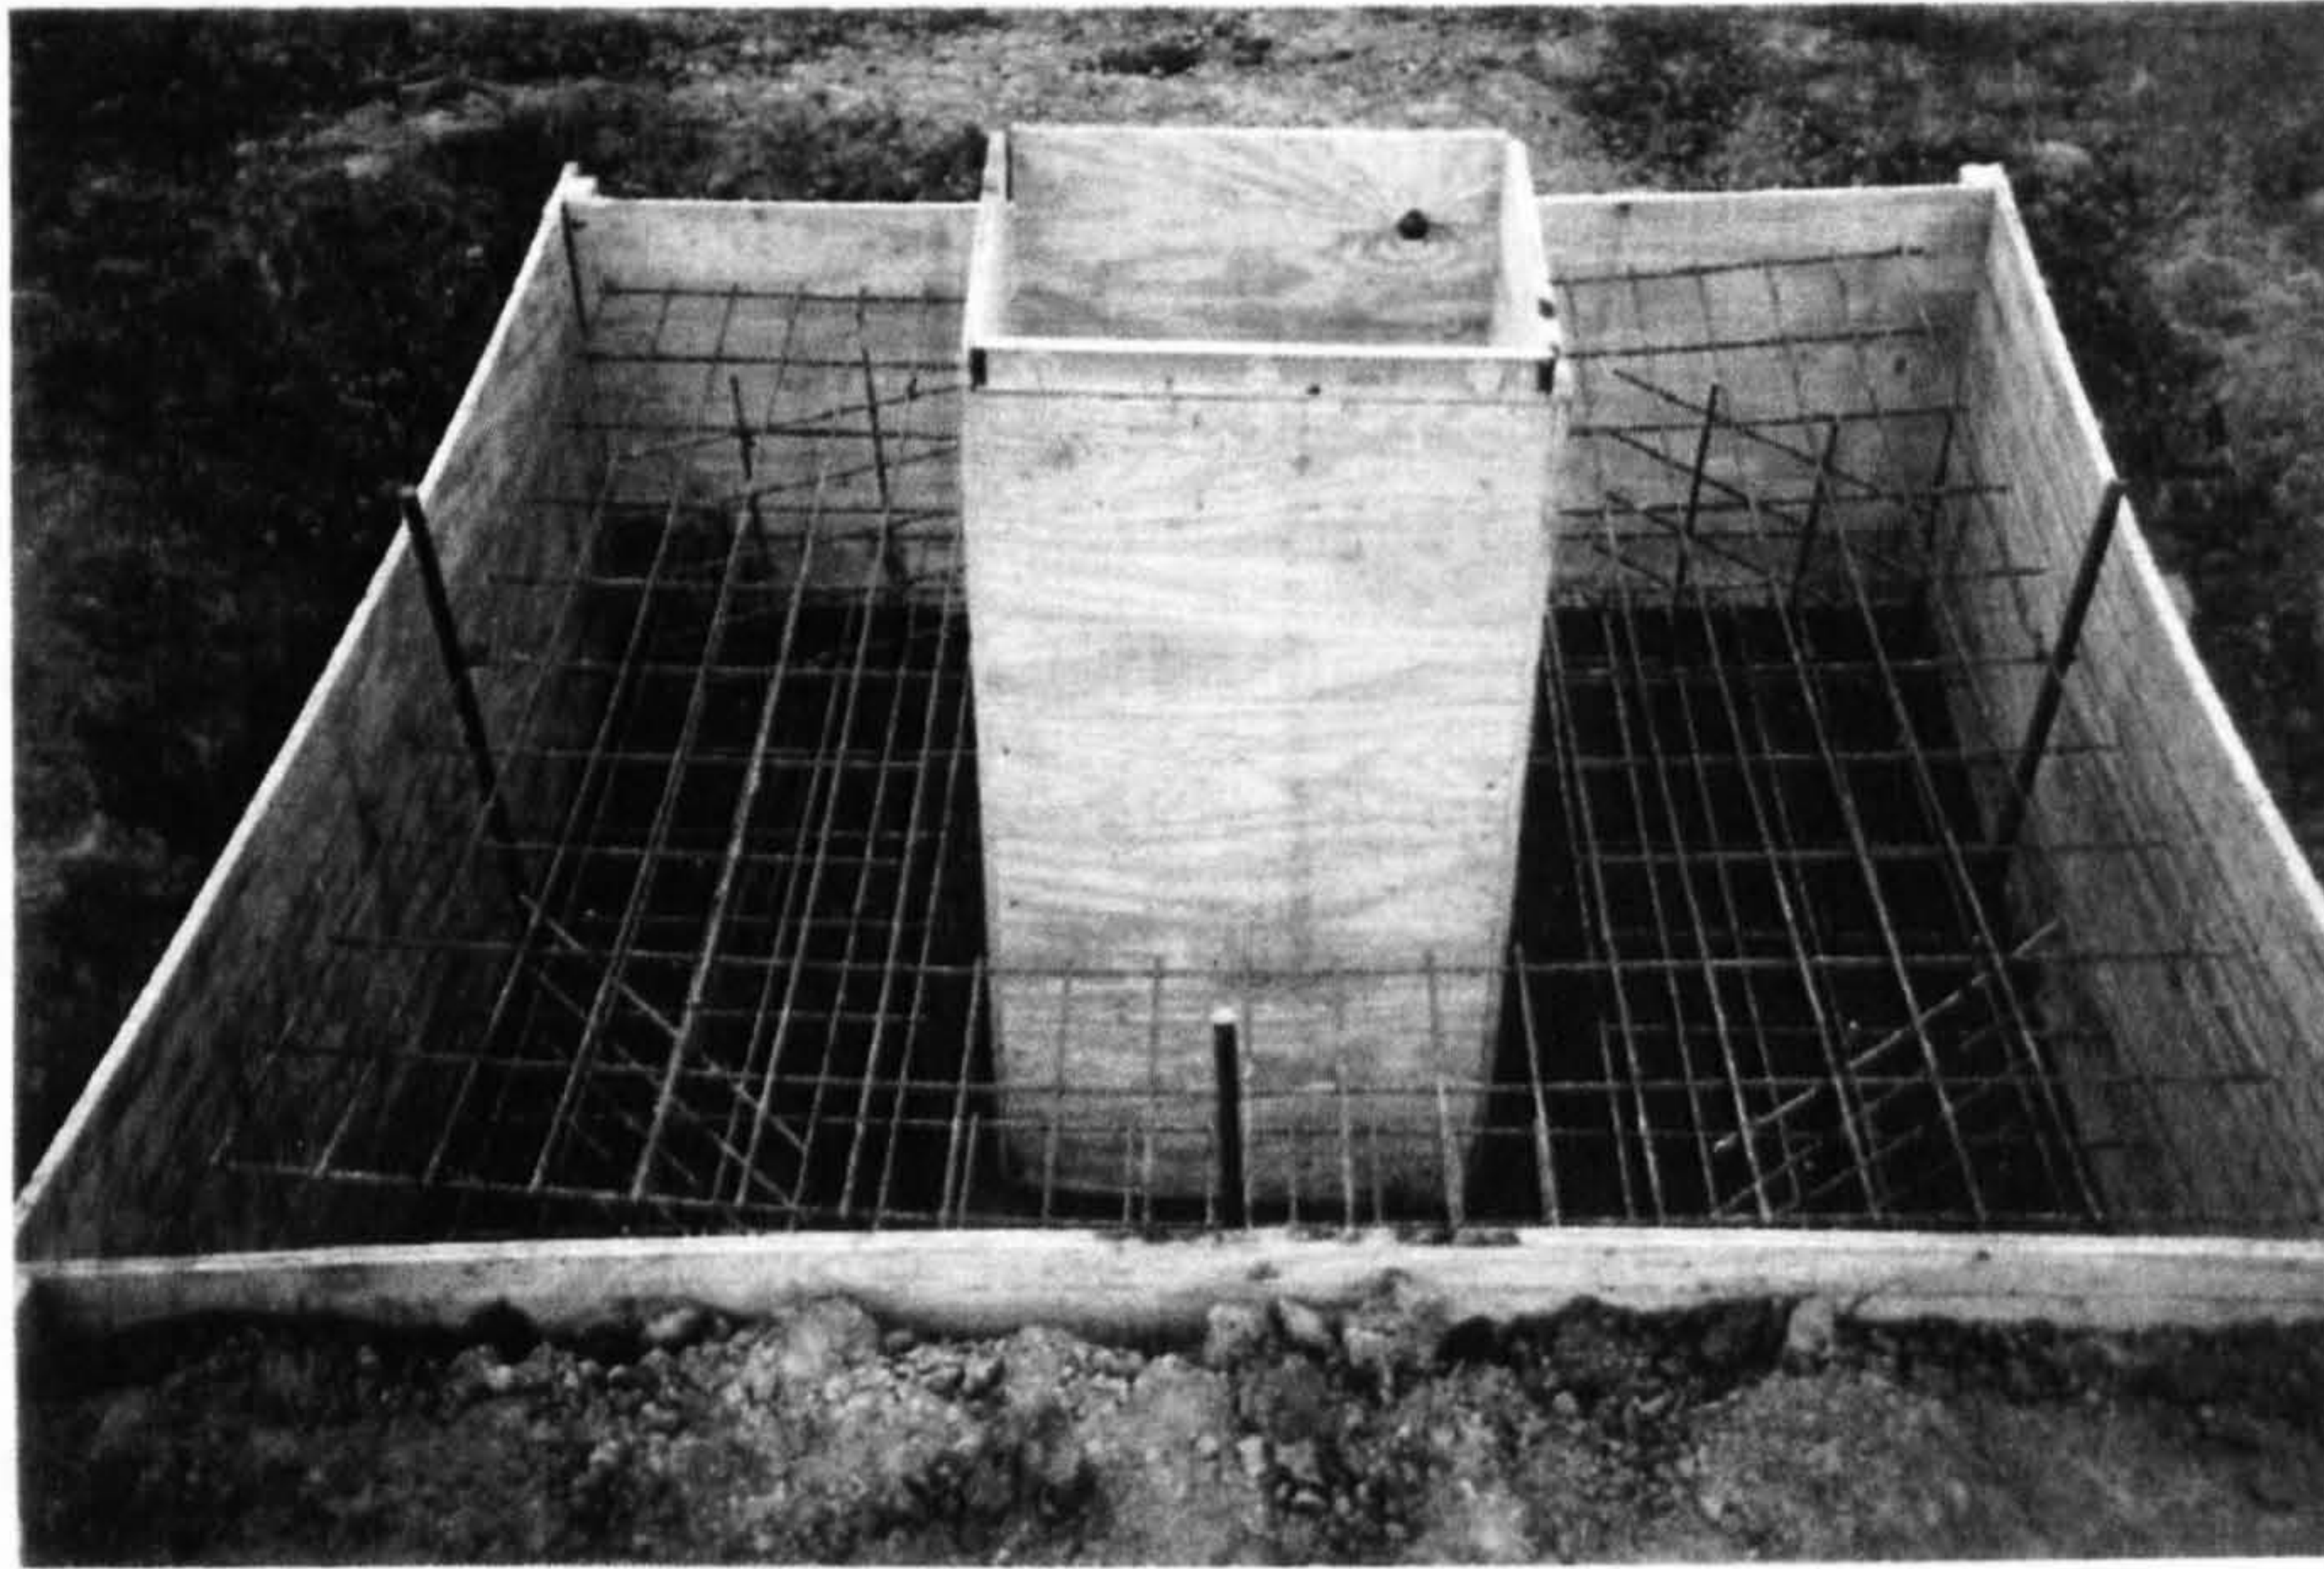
Construction of the test footings (after Gildea, 1990).
